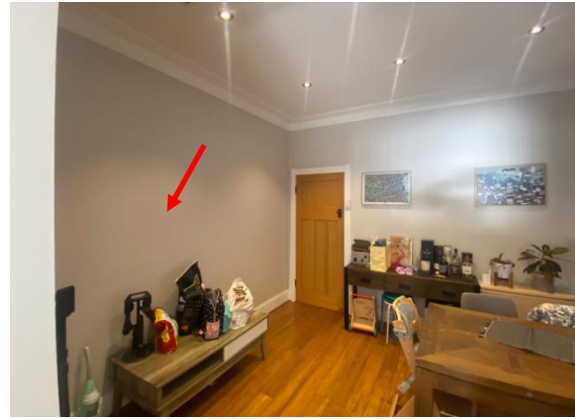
Proposed wall between dining room and bedroom 3 to be demolished indicated in red (Source: Three + One Heritage, 26.08.24)
